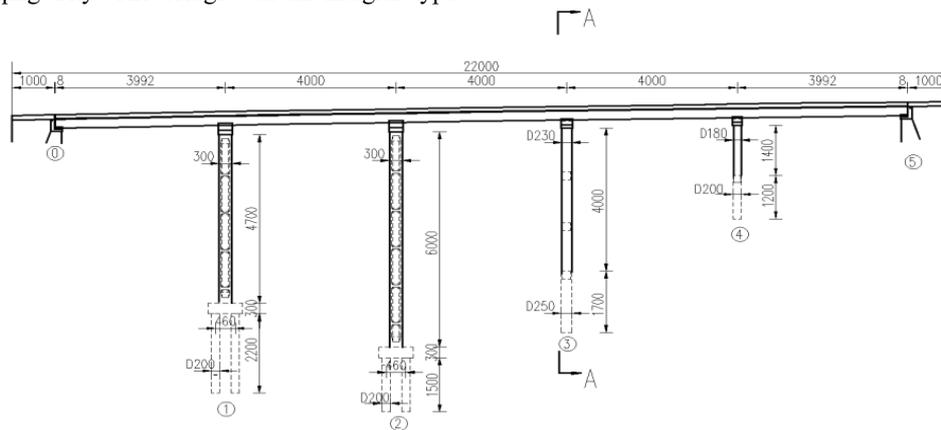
Layout Drawing of Bridge Elevation (unit: cm)
